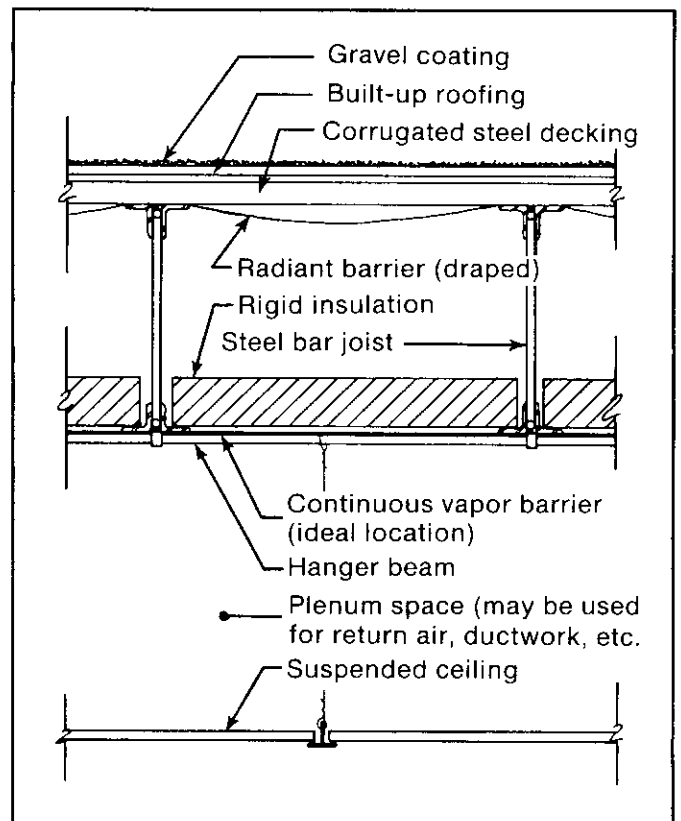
Detail of Ideal Radiant Barrier Construction for Typical Flat-Roof Commercial Building
